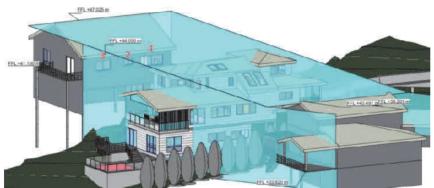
3D impression of proposed development (subject site is central, 26 Wandeen Road is above the subject site).
